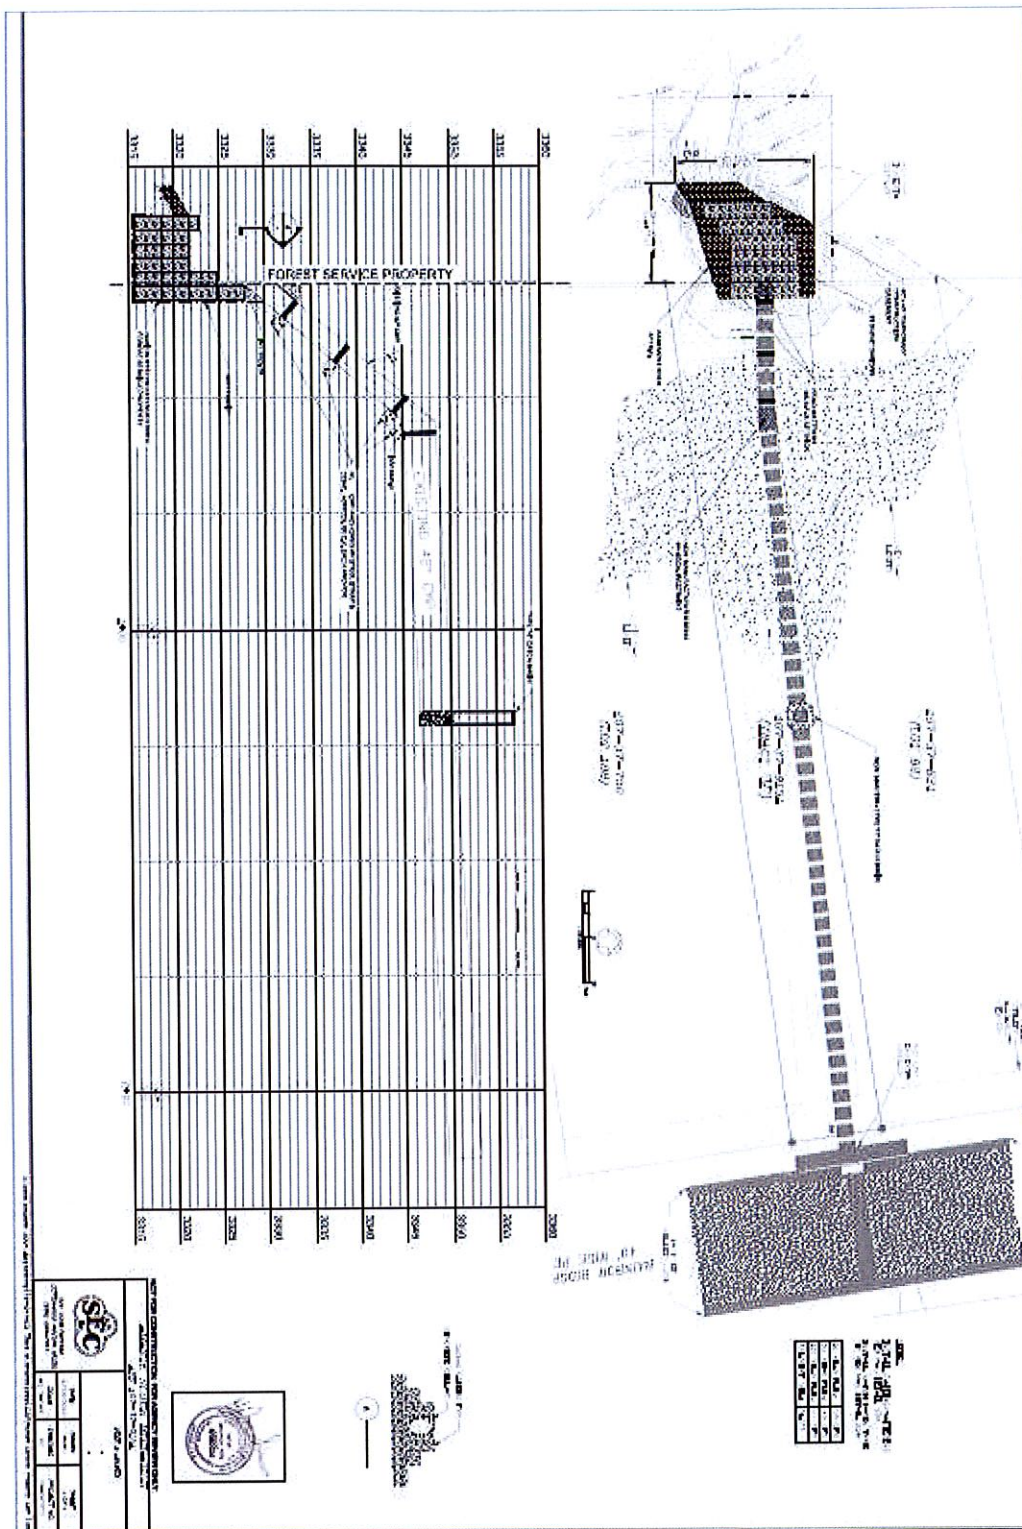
Full view of drainage mitigation construction design at Amante at Verde Santa Fe. Work taking place on USFS land is limited to the reno mattress and occurs within an existing drainage. No easement is needed.
